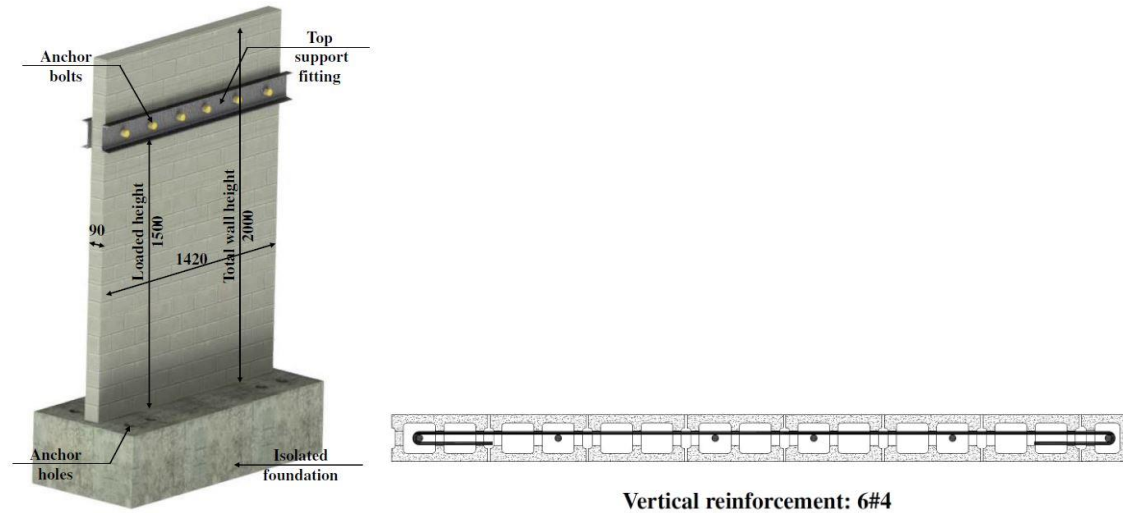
Studied Wall: (a) 3D View for the Wall (in Millimeters) (b) Typical Cross Section [3]
